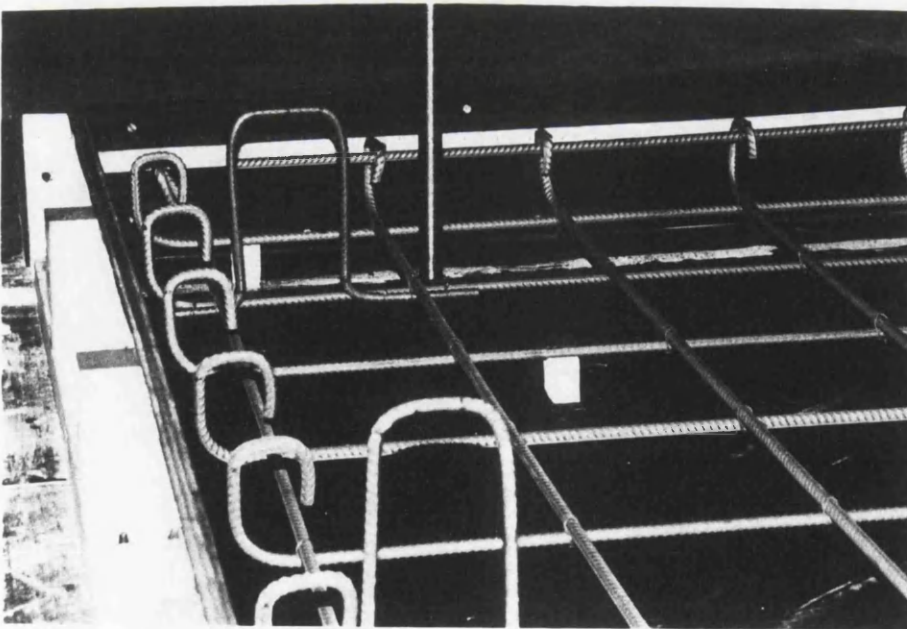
Details of the form work and reinforcement of test specimens.
